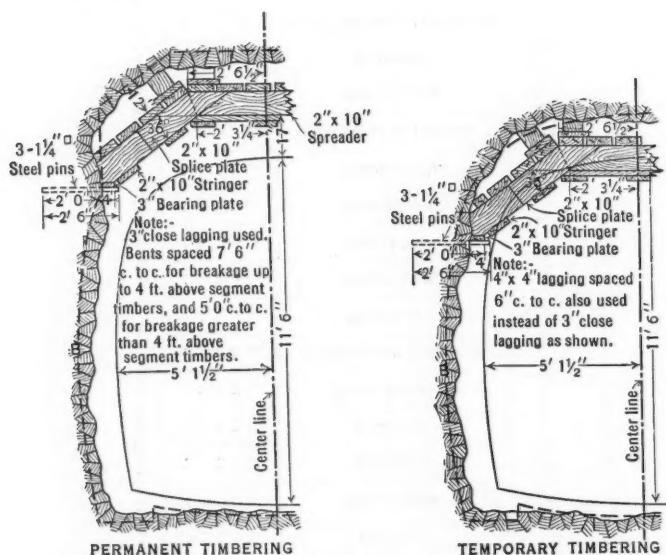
STANDARD TIMBER ROOF SUPPORT, SHANDAKEN TUNNEL.
